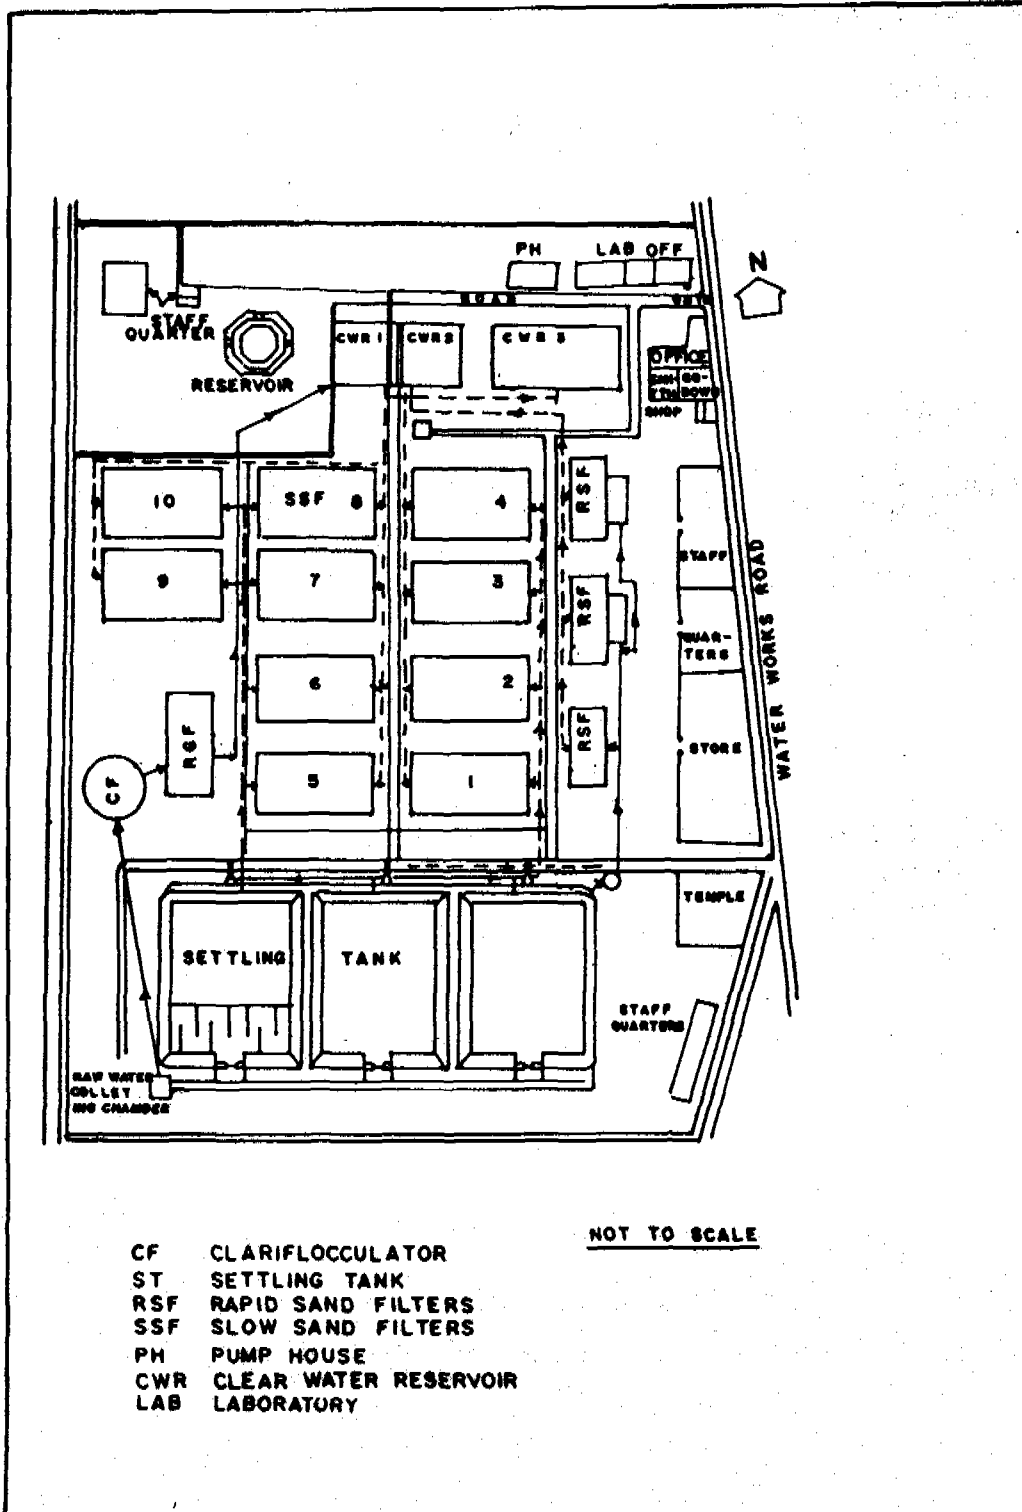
LAYOUT PLAN OF AISHBAGH WATER WORKS, LUCKNOW
